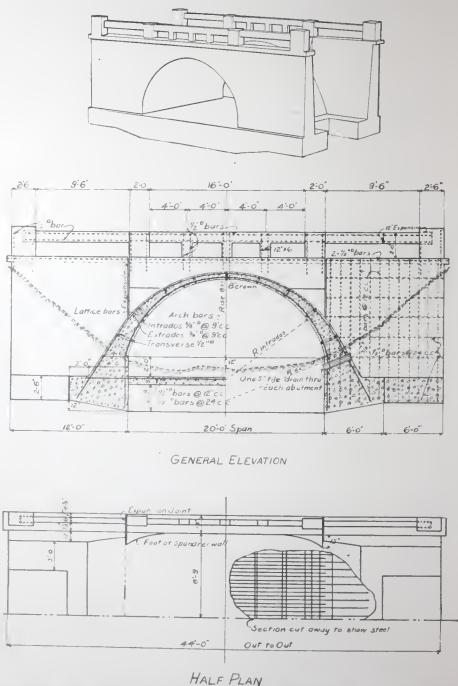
Standard Design. 20-foot span; 8-foot rise; Reinforced Concrete. Iowa Highway Commission.
